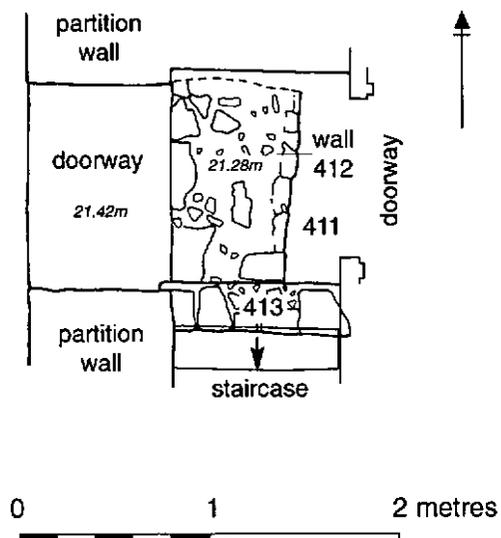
Plan showing medieval wall 412 and post-medieval wall 413, both within the farmhouse, scale 1:40
